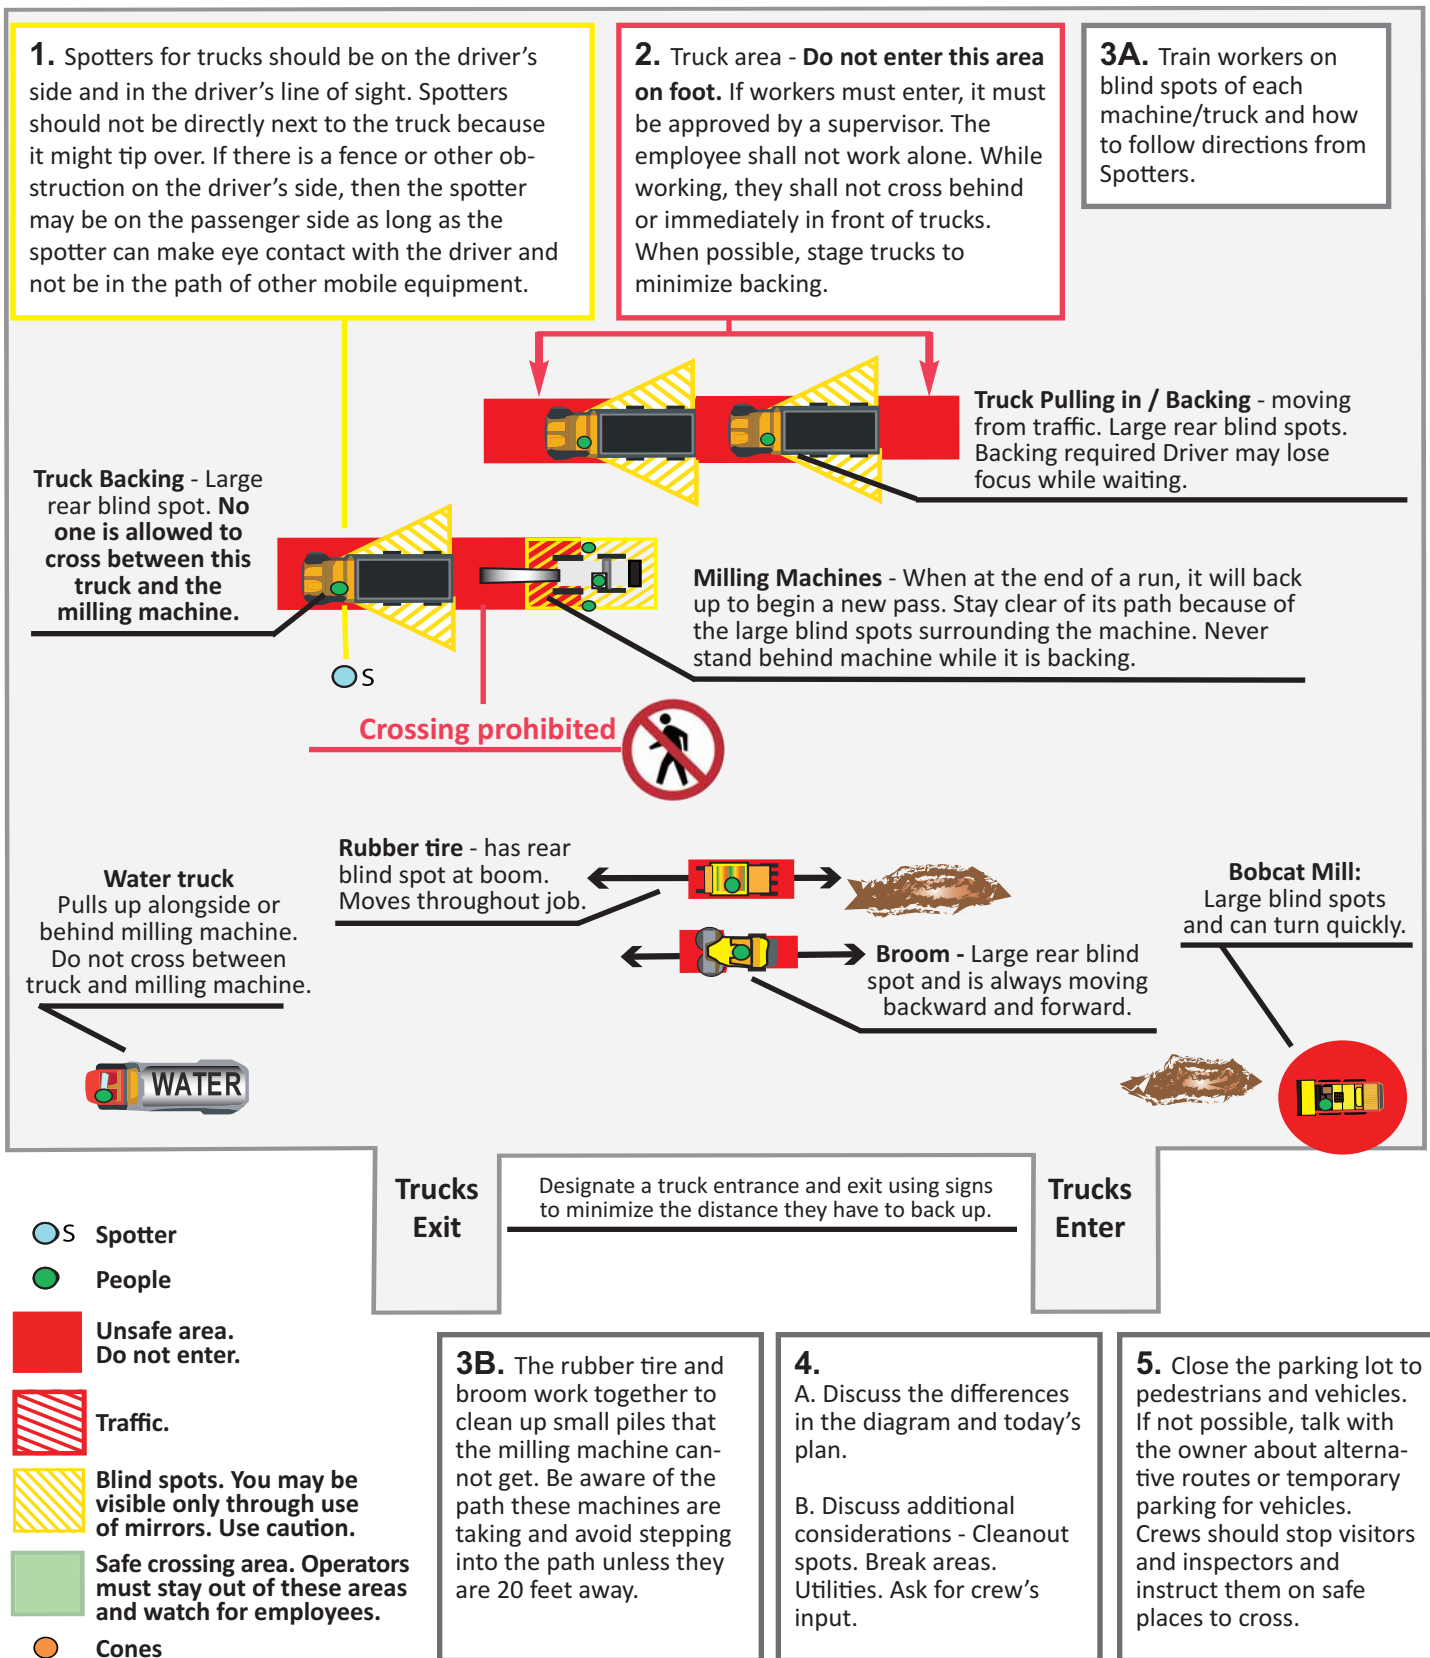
Example diagram of vehicle, equipment, and worker locations and movements for an asphalt milling parking lot (Source: Adapted from Barriere Construction, Safe Zones, 2014)⁶
